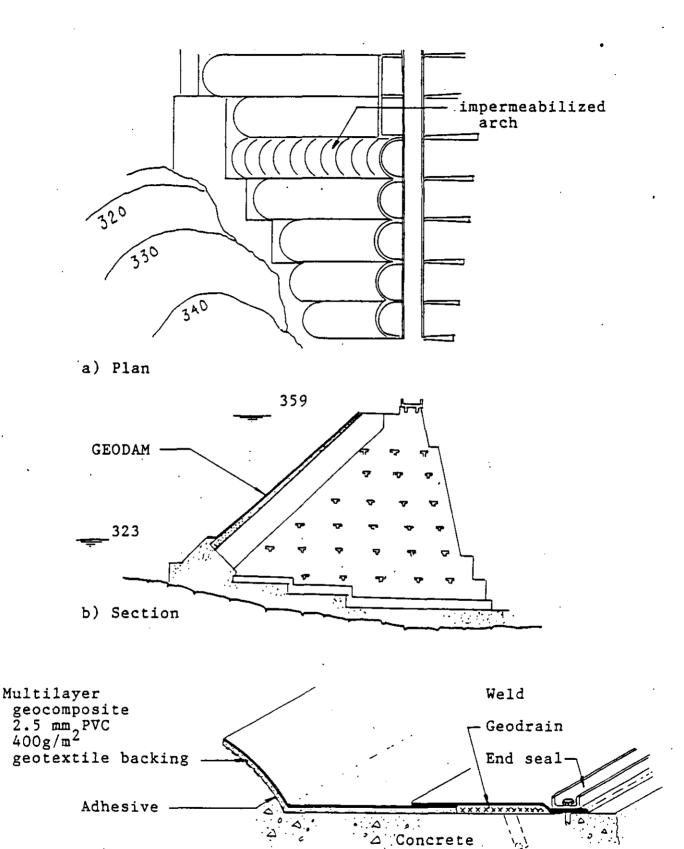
Concrete multiple thin shell dam repaired with a surface multilayer PVC geocomposite fixed with adhesives.
